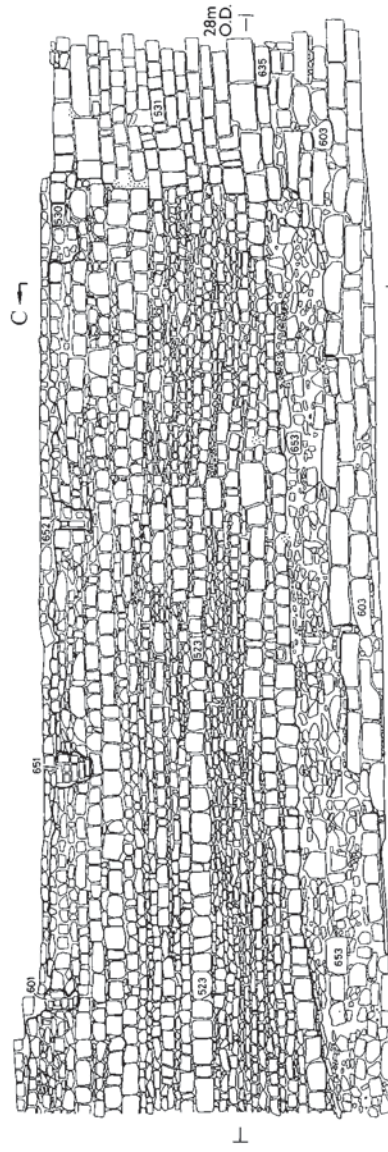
Western Way-Watergate external elevation, sections. Scale 1:100.
